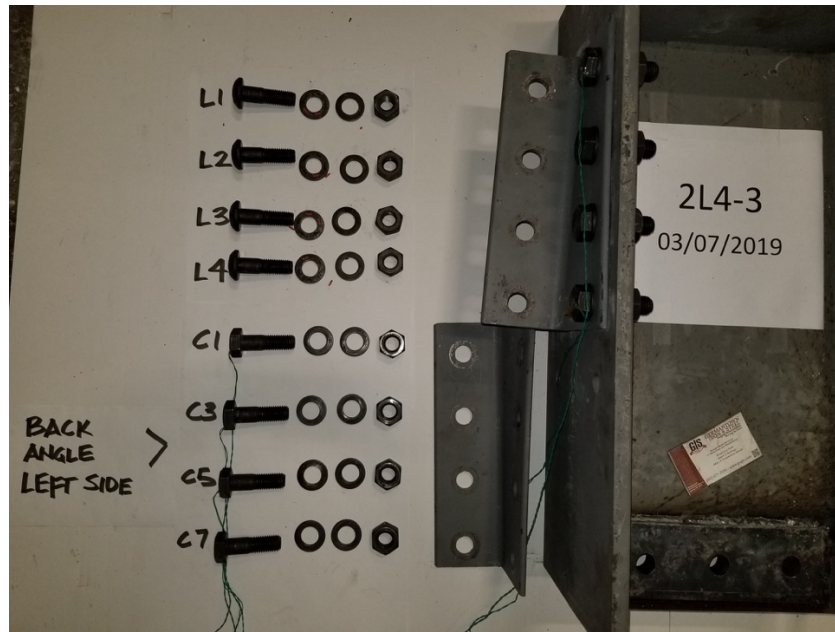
Typical left hand-side of a 2L4 series specimen following testing.
